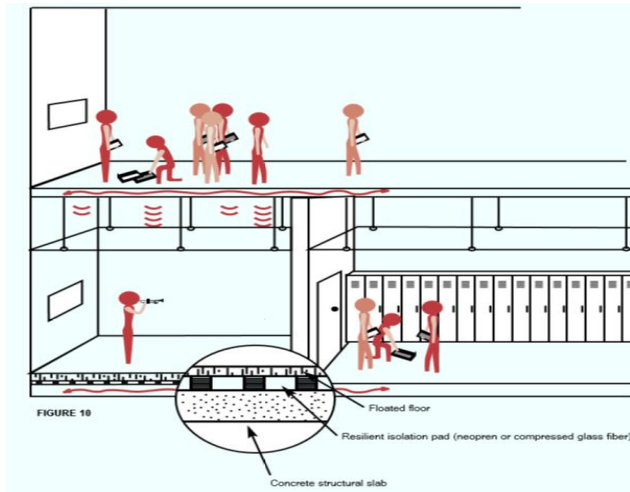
Ceiling and Floor Solution (Ref No. 4).
